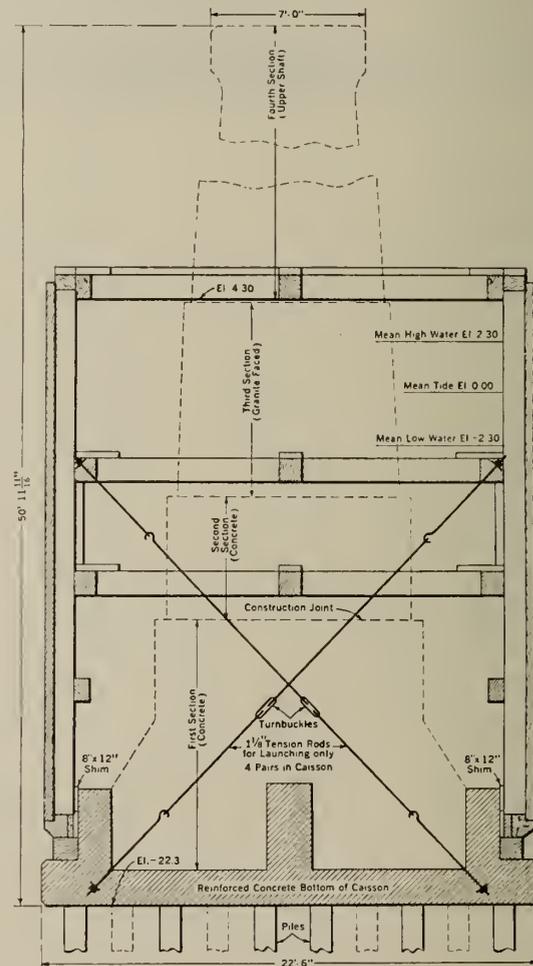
Section Through Concrete-Bottomed Cofferdam for Piers of Newark Bay Bridge. Jersey Central Railroad.
